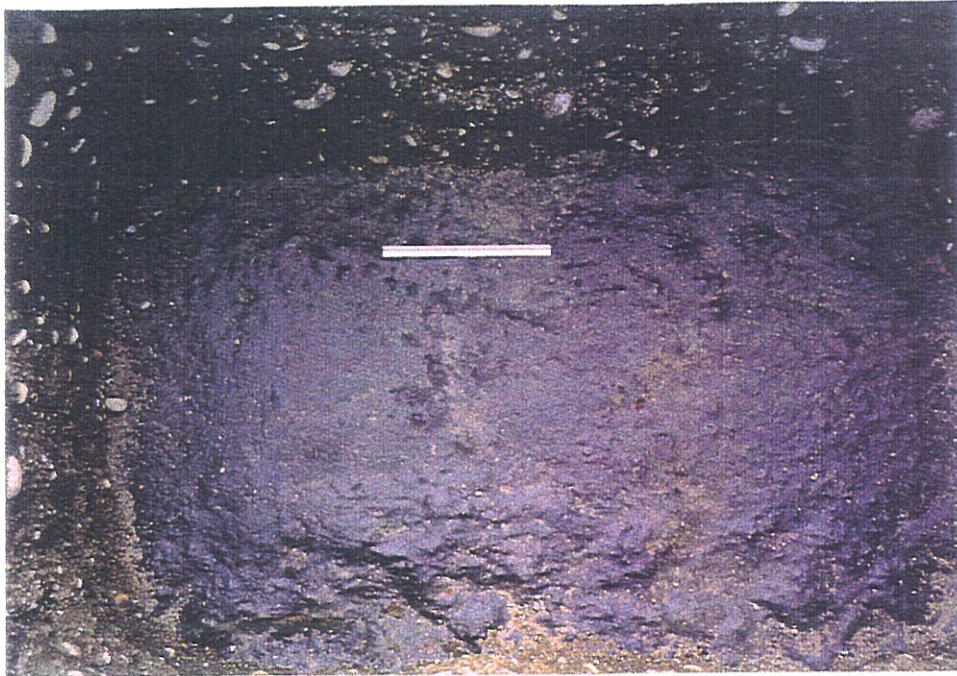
Upper surface of the geotextile exposed in the test pit.
